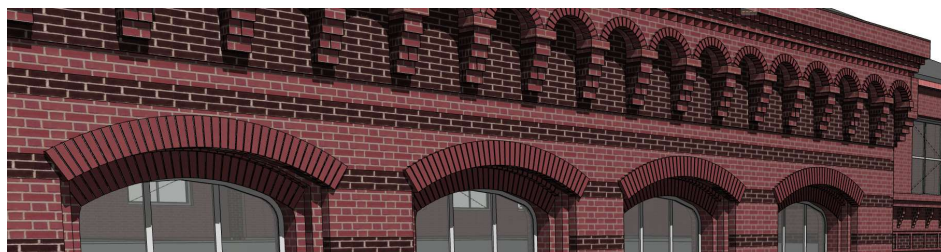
Façade detail modelled in Archicad (model author: Jan Okoniewski, ZSB in Poznan)
